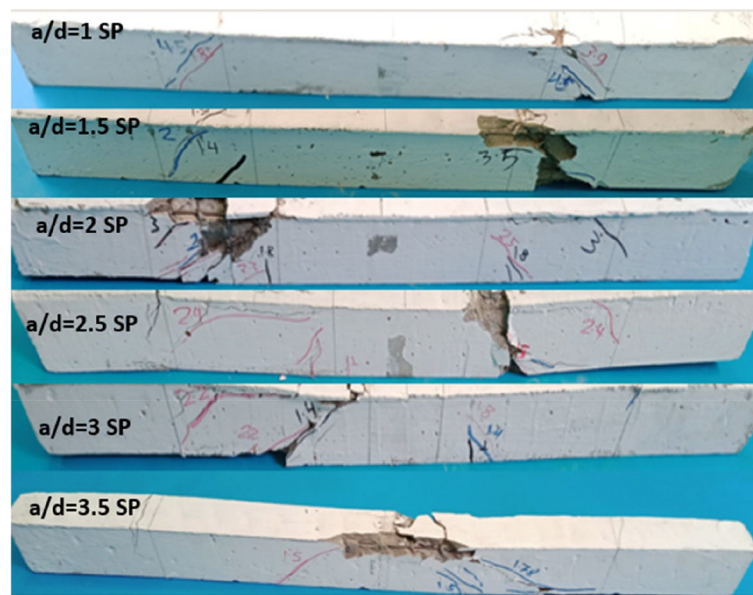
Cracking pattern of spiral stirrup for B17, B18, B19, B20, B21, and B22
